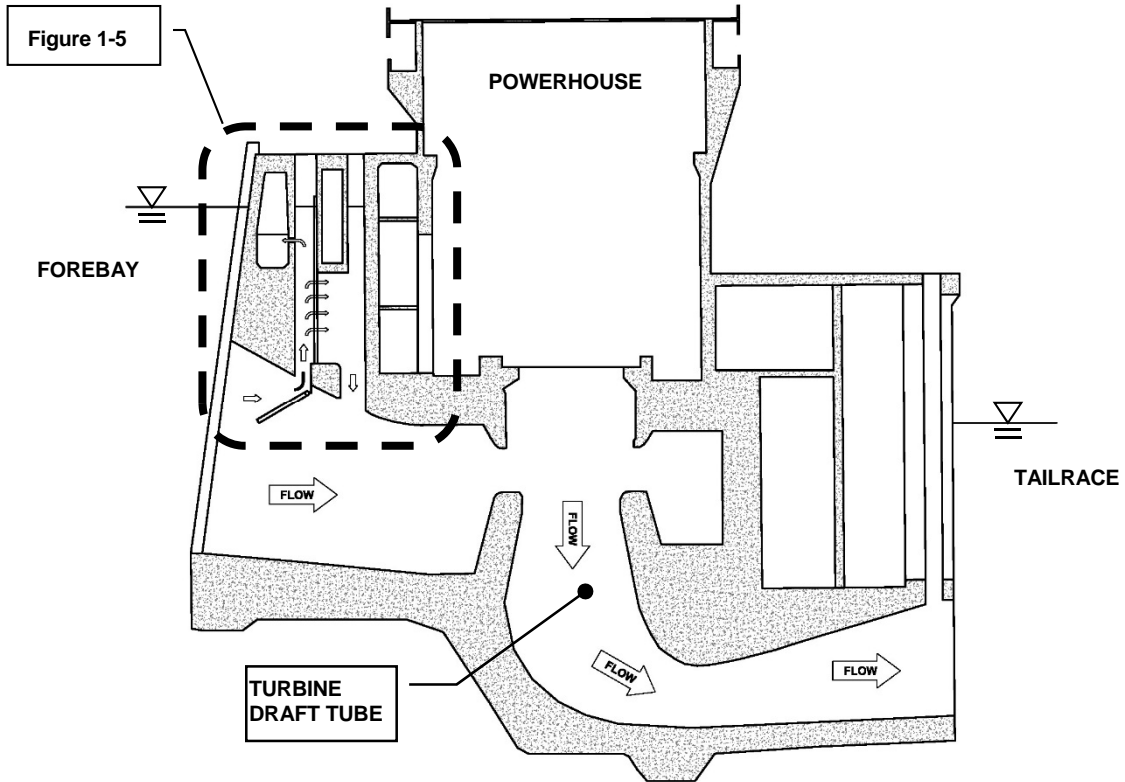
Cross Section of Bonneville Dam Second Powerhouse
